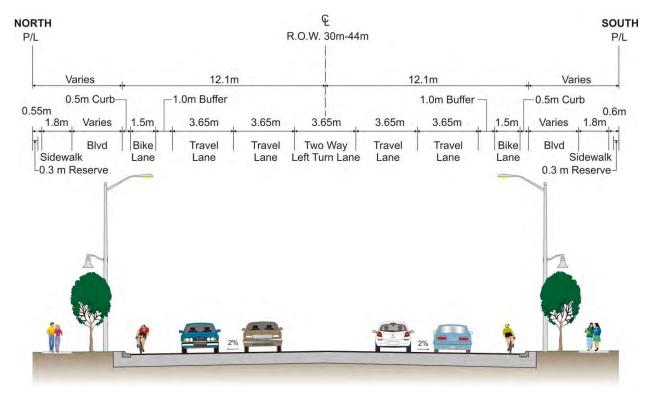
TYPICAL CROSS-SECTION COUNTY ROAD 42 WALKER ROAD TO THE CITY/COUNTY BOUNDARY
